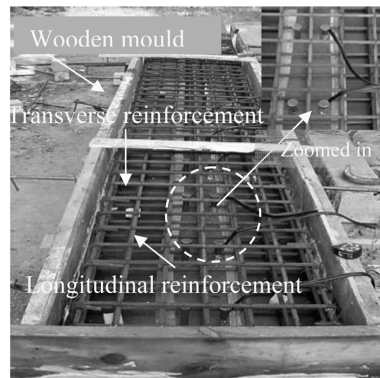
Rolled steel beams with welded stud and reinforcement mesh
